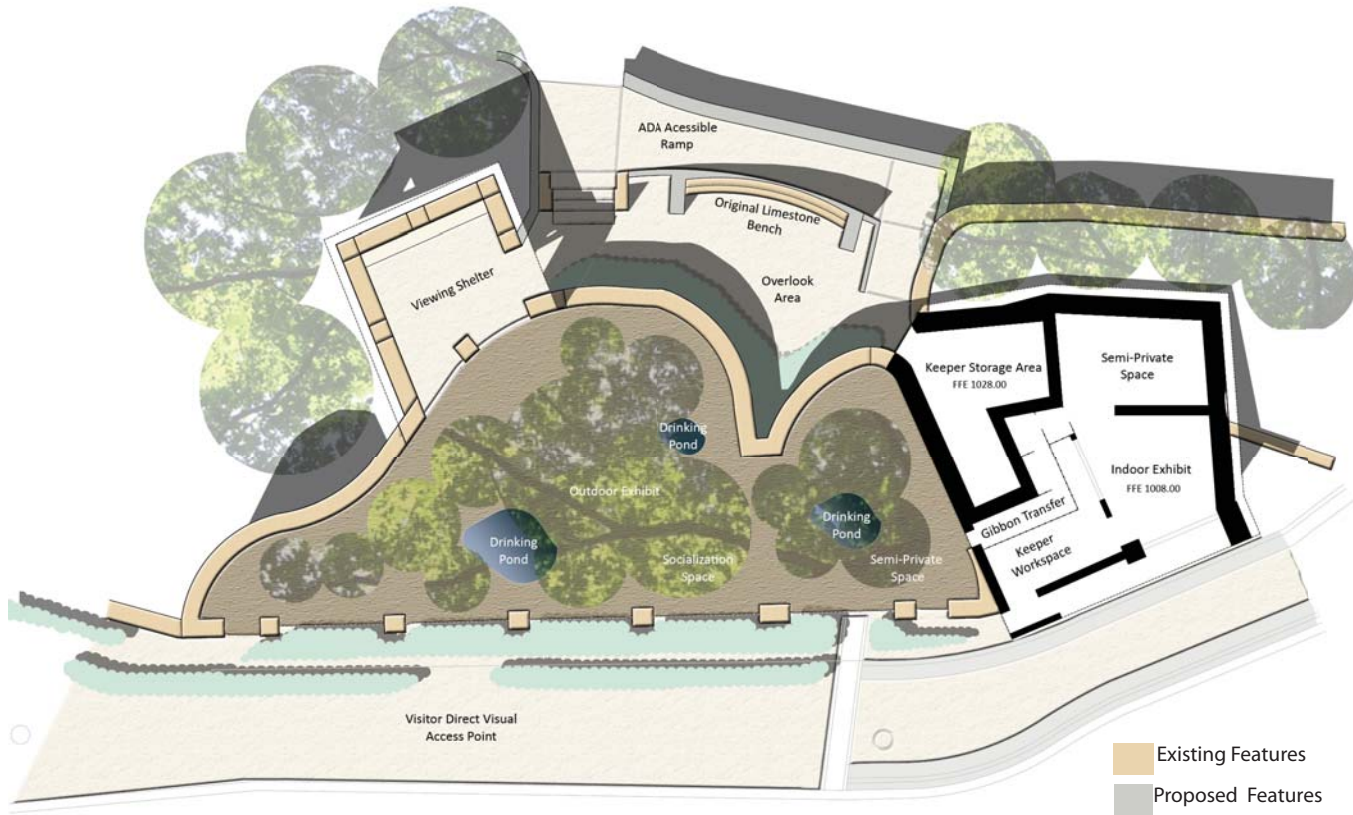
Site Plan: Animal Features (Morrow, 2009).
